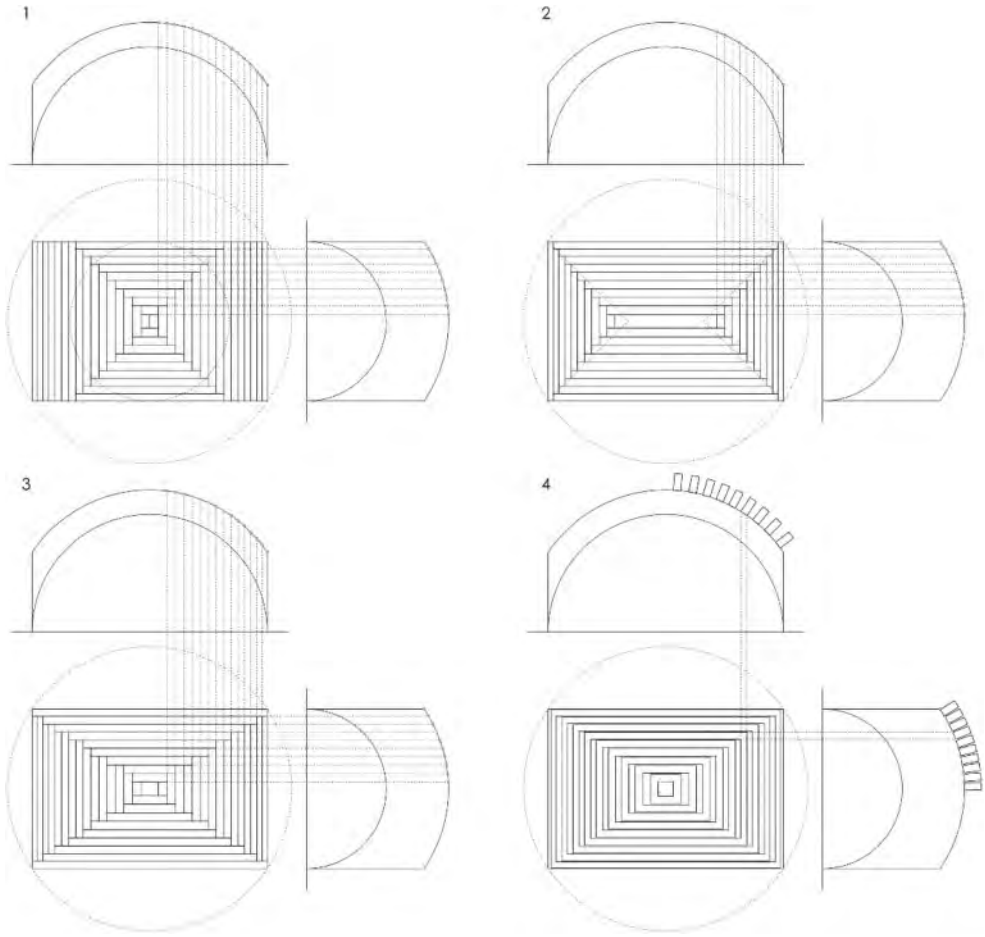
Different alternatives to solve a rectangular plan sail brick vault by slices. By the authors.
